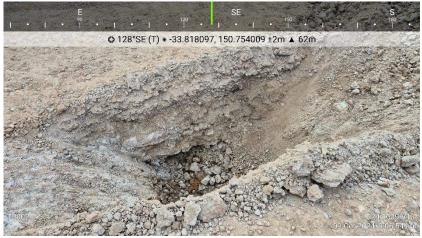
Scraped fill material at the southeastern corner of the site
